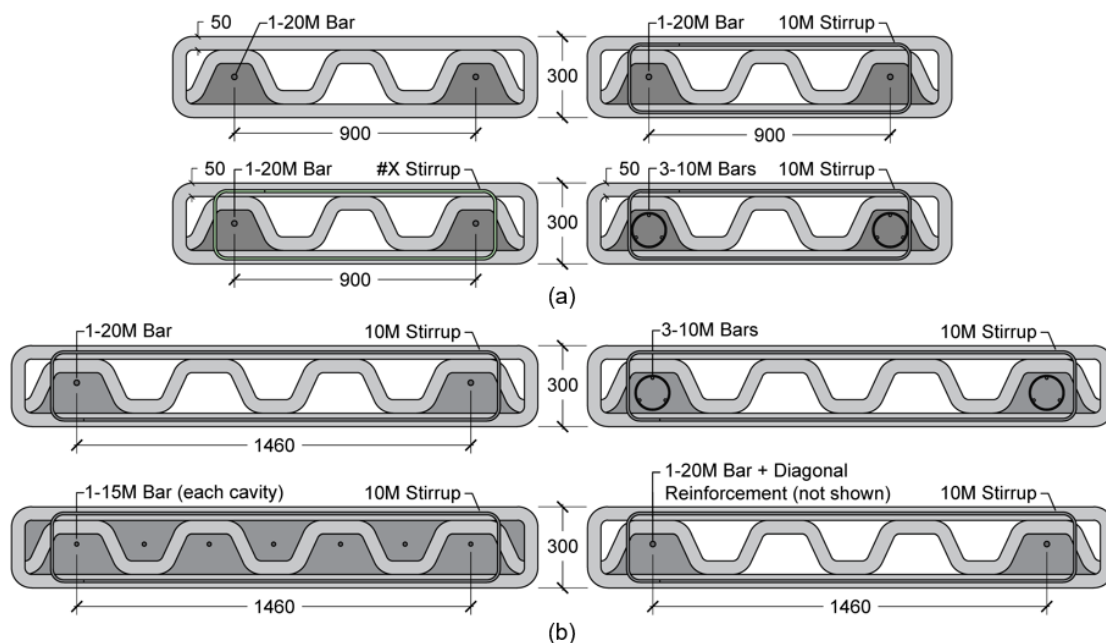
Shear wall cross-section details: (a) slender walls with aspect ratio of 2.0, including walls with and without shear reinforcement and different boundary element details, (b) intermediate walls with aspect ratio of 1.35, including walls with different boundary element details (see Table 1).
